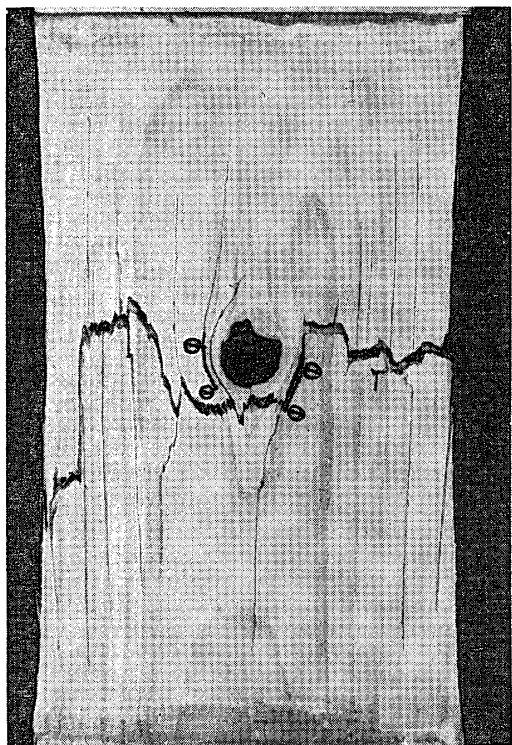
Pith side face of knotty specimen after failure test (Specimen No. 1).
